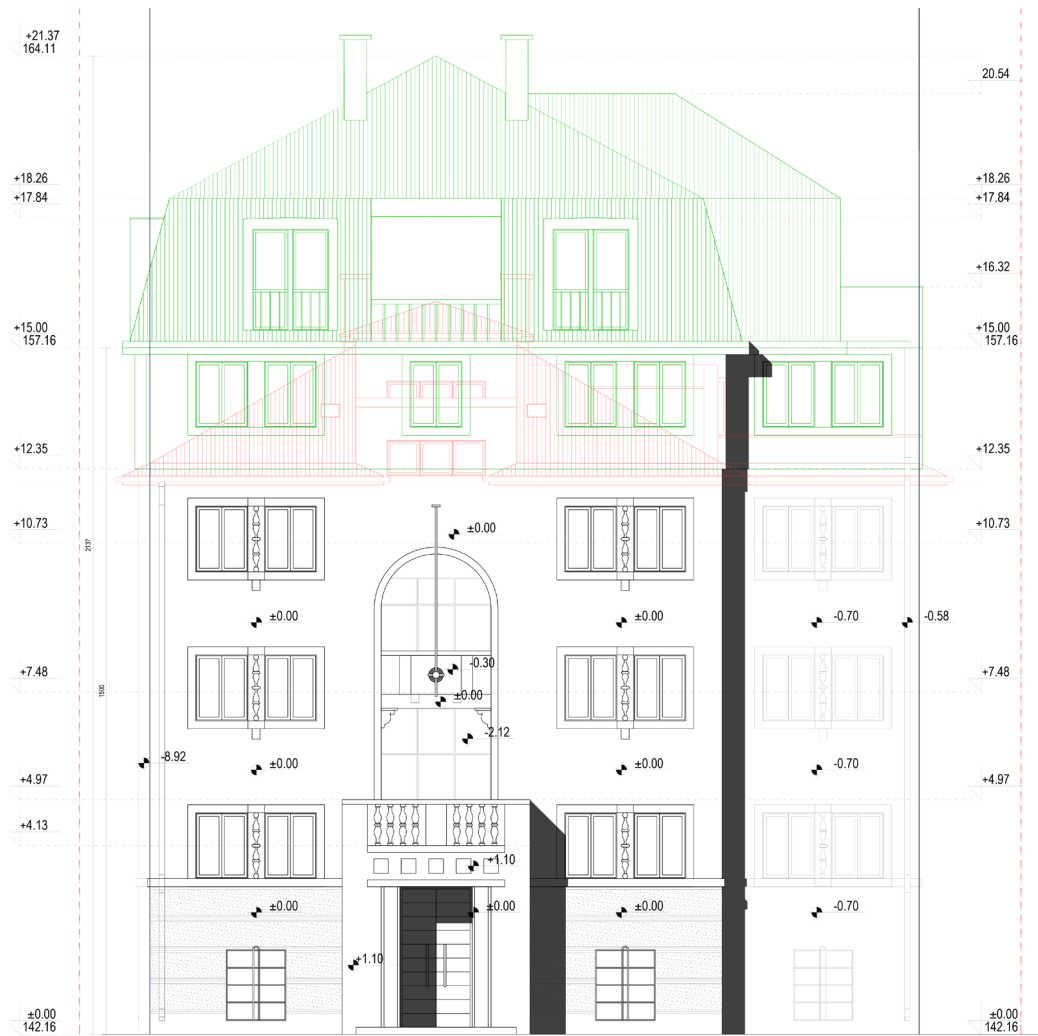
Existing building and planned extension overlapped, Author's drawing based on Archive design, on-site measurements and planned extension
